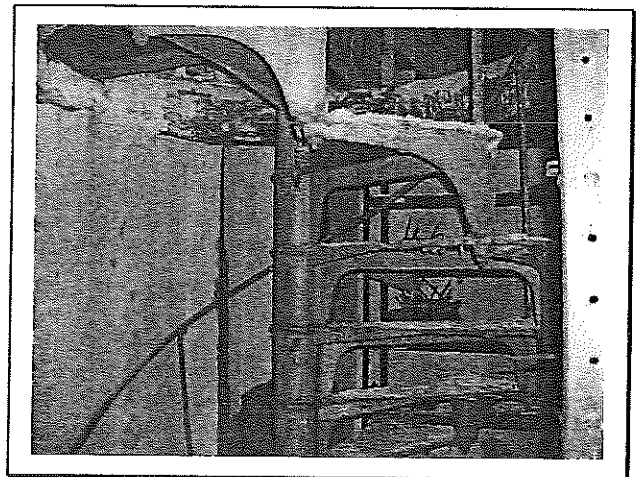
Viewing gray spiral staircase, 2nd floor – Vault.
